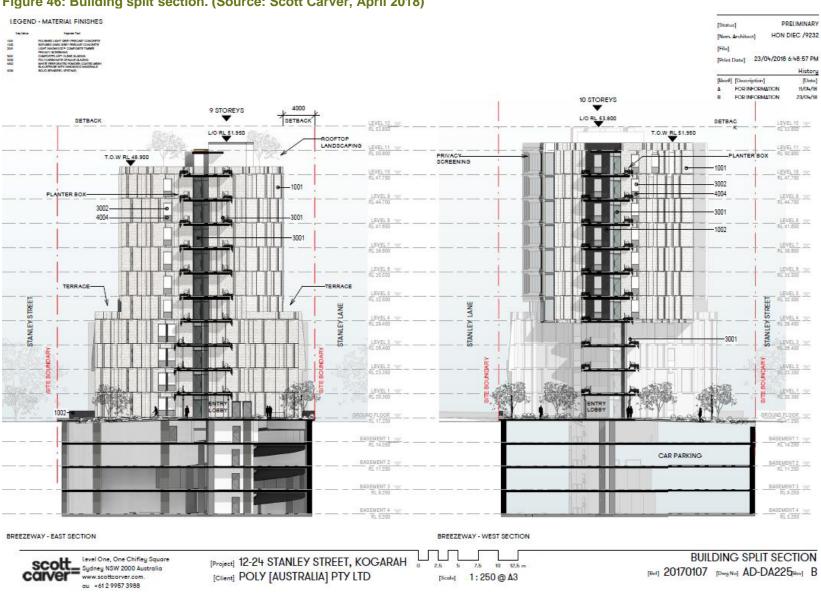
Building split section. (Source: Scott Carver, April 2018)
